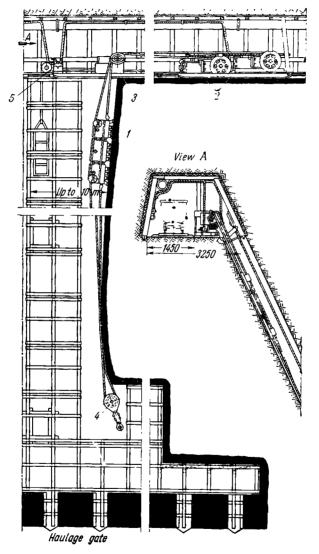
Layout of YBK-1 (UVK-1) mining system
